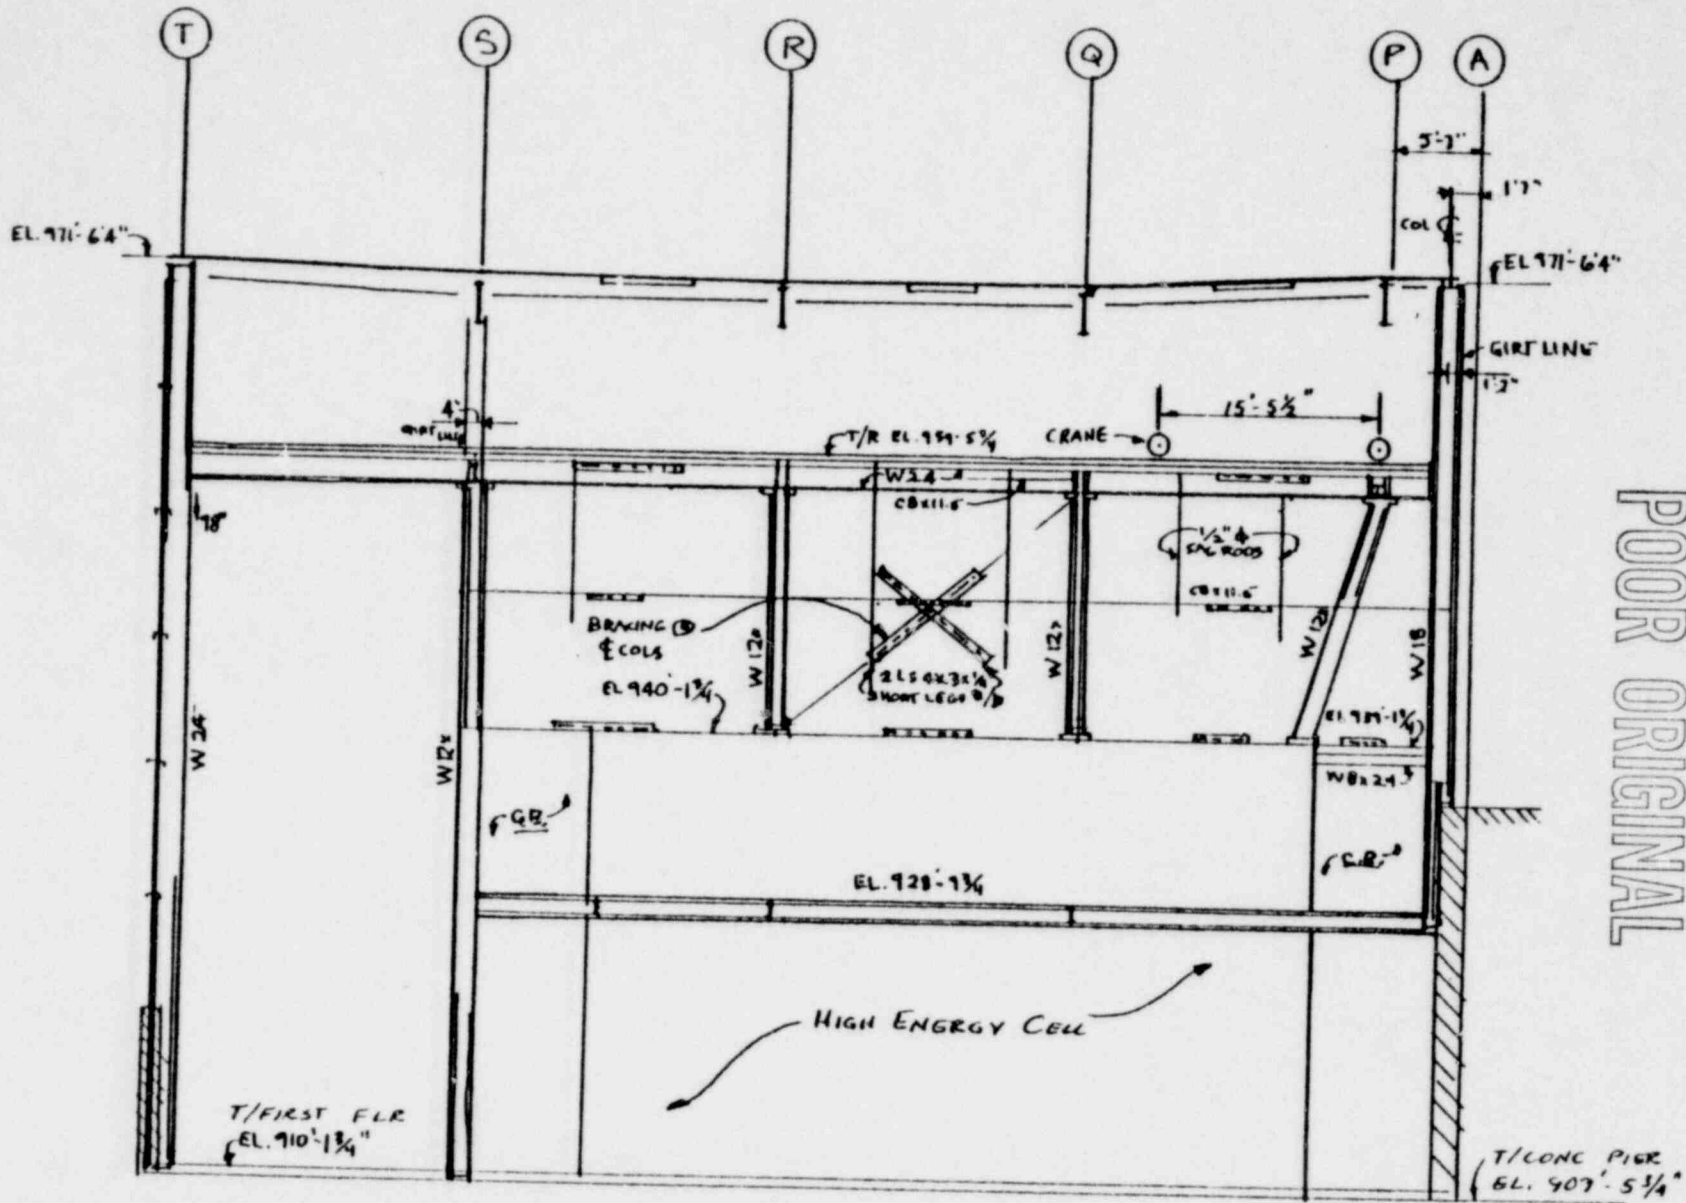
JN-1B CROSS BRACING FOR CRANE FRAMING AT LINE 13
